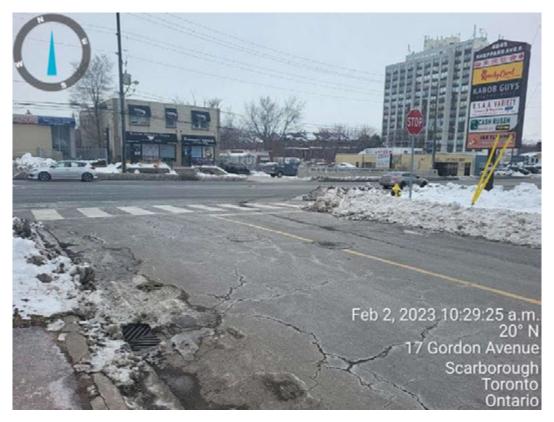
Moderate severity random/alligator cracking throughout pavement as noted in close up.
